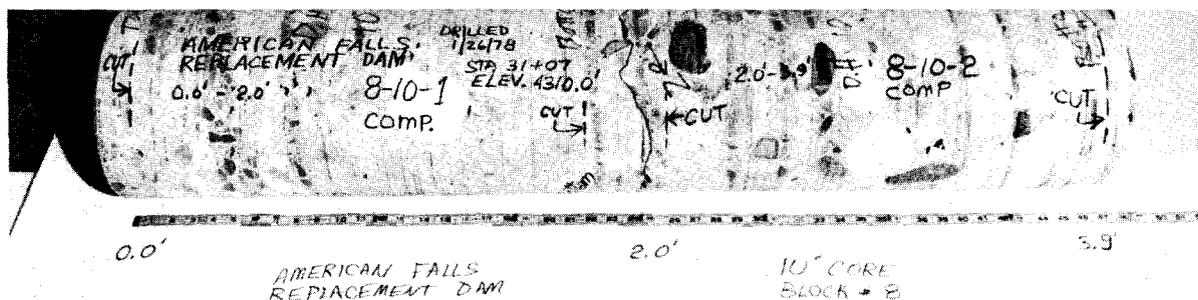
Typical 10-in-diameter concrete core, American Falls Replacement Dam.
